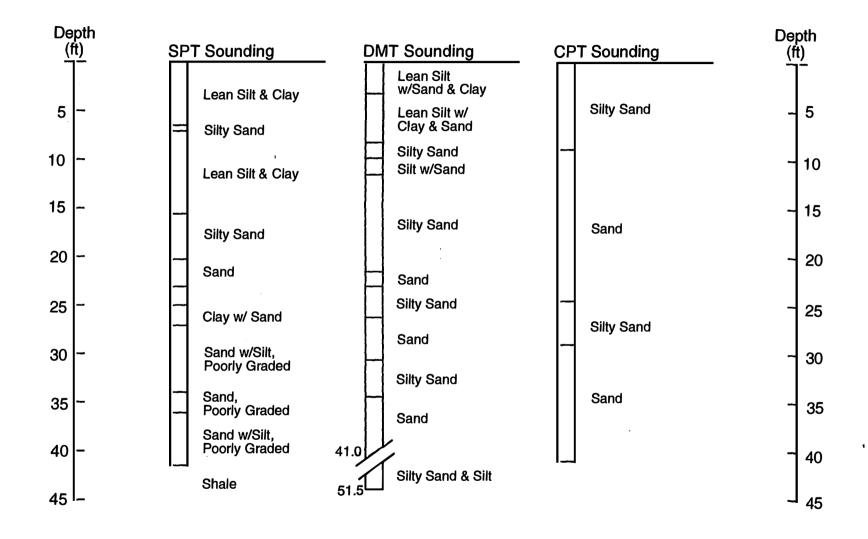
Soil Profile Based on In Situ Testing at Abutment C2
